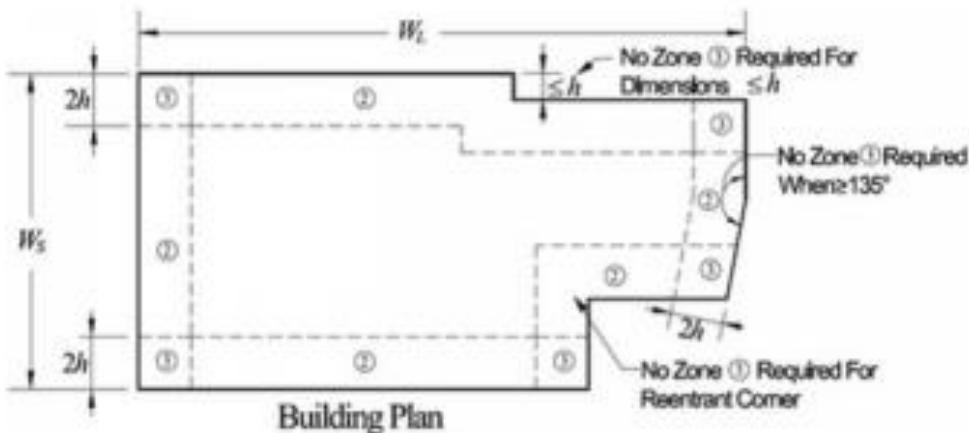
ASCE 7-16 Figure C29.4-1 shows a sketch of Building with Irregular Plan Dimensions
